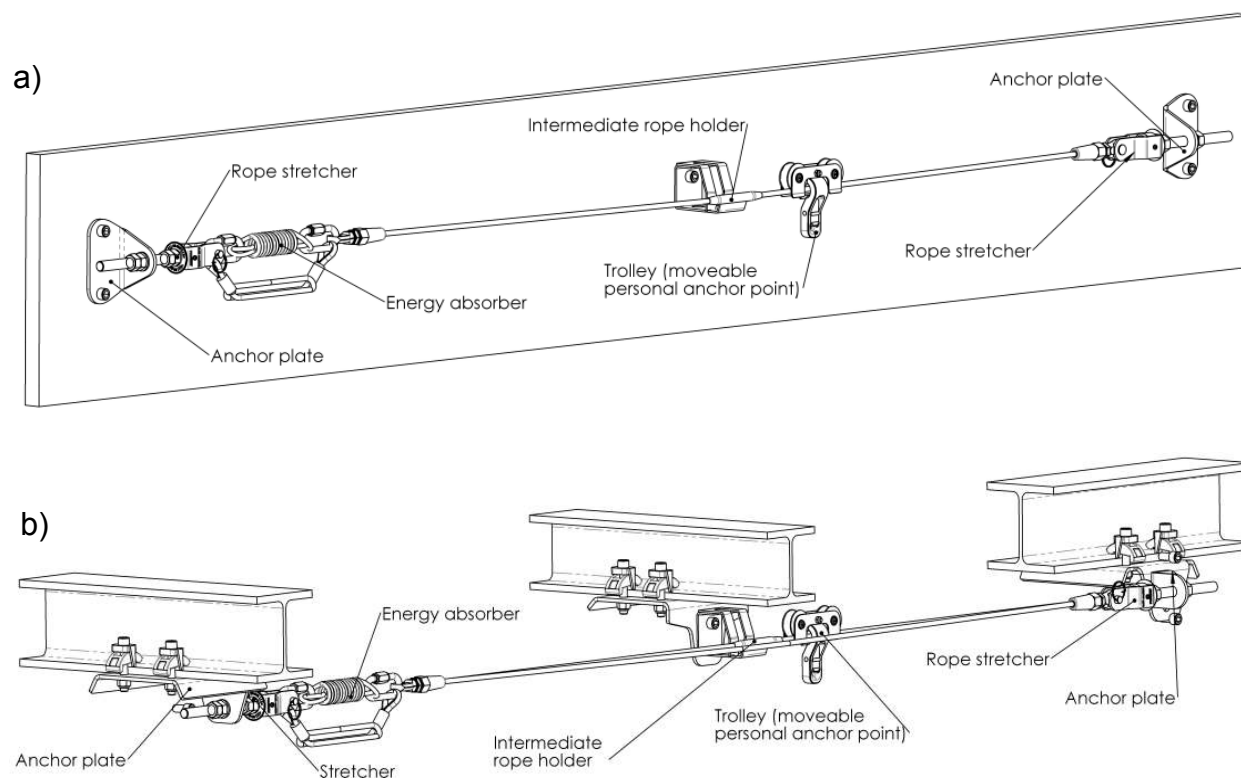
The MONOLINE system; a) – "on wall" installation; b) – "on beams" installation.
